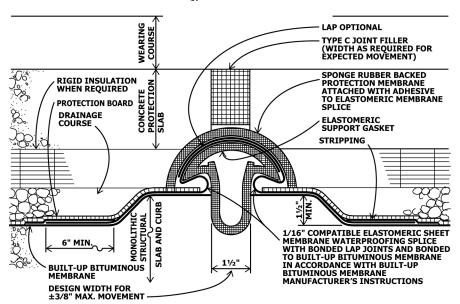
Water Shed Concept Expansion Joint (see 8.8.7.2)
